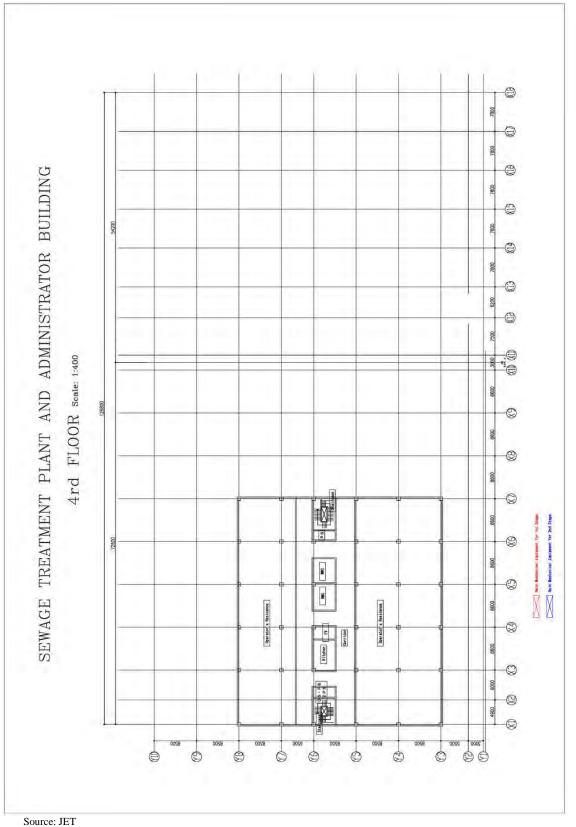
Sewage Treatment Plant and Administartion Building 4th Floor
